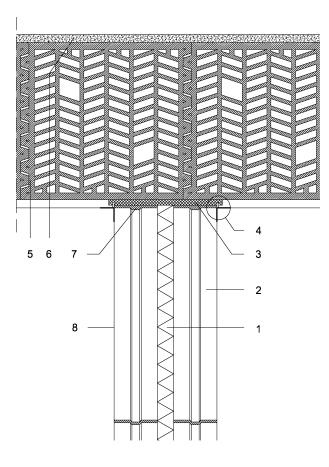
External wall. Joining between double leaf partition and external insulation (for rigid insulations).
